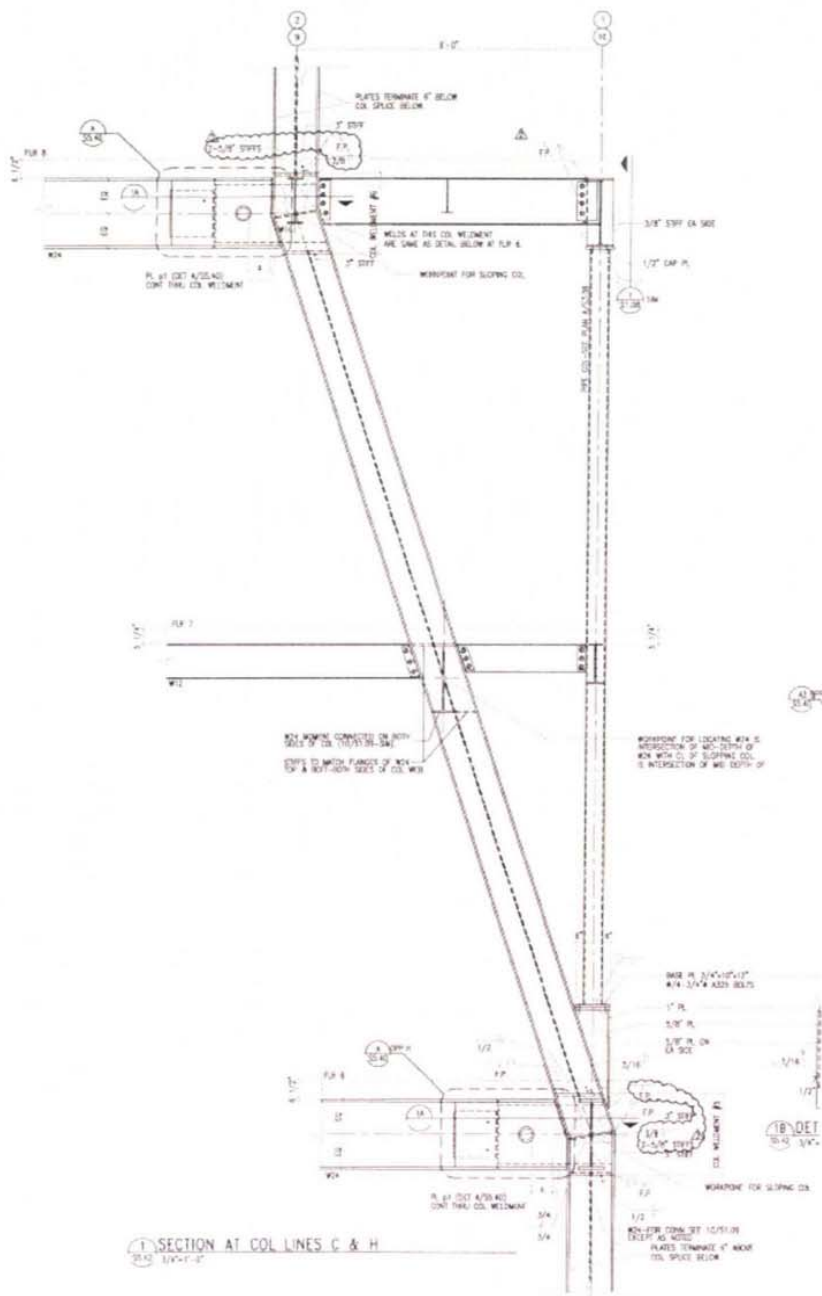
Inclined Column used in 560 Mission Building designed by CBM Engineers
